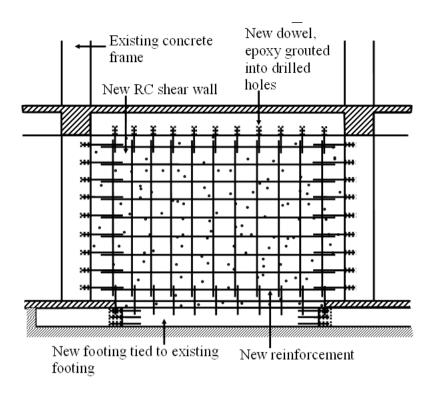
Adding new RC structural walls within the beam-column bays of RC frame with additional concrete and steel
